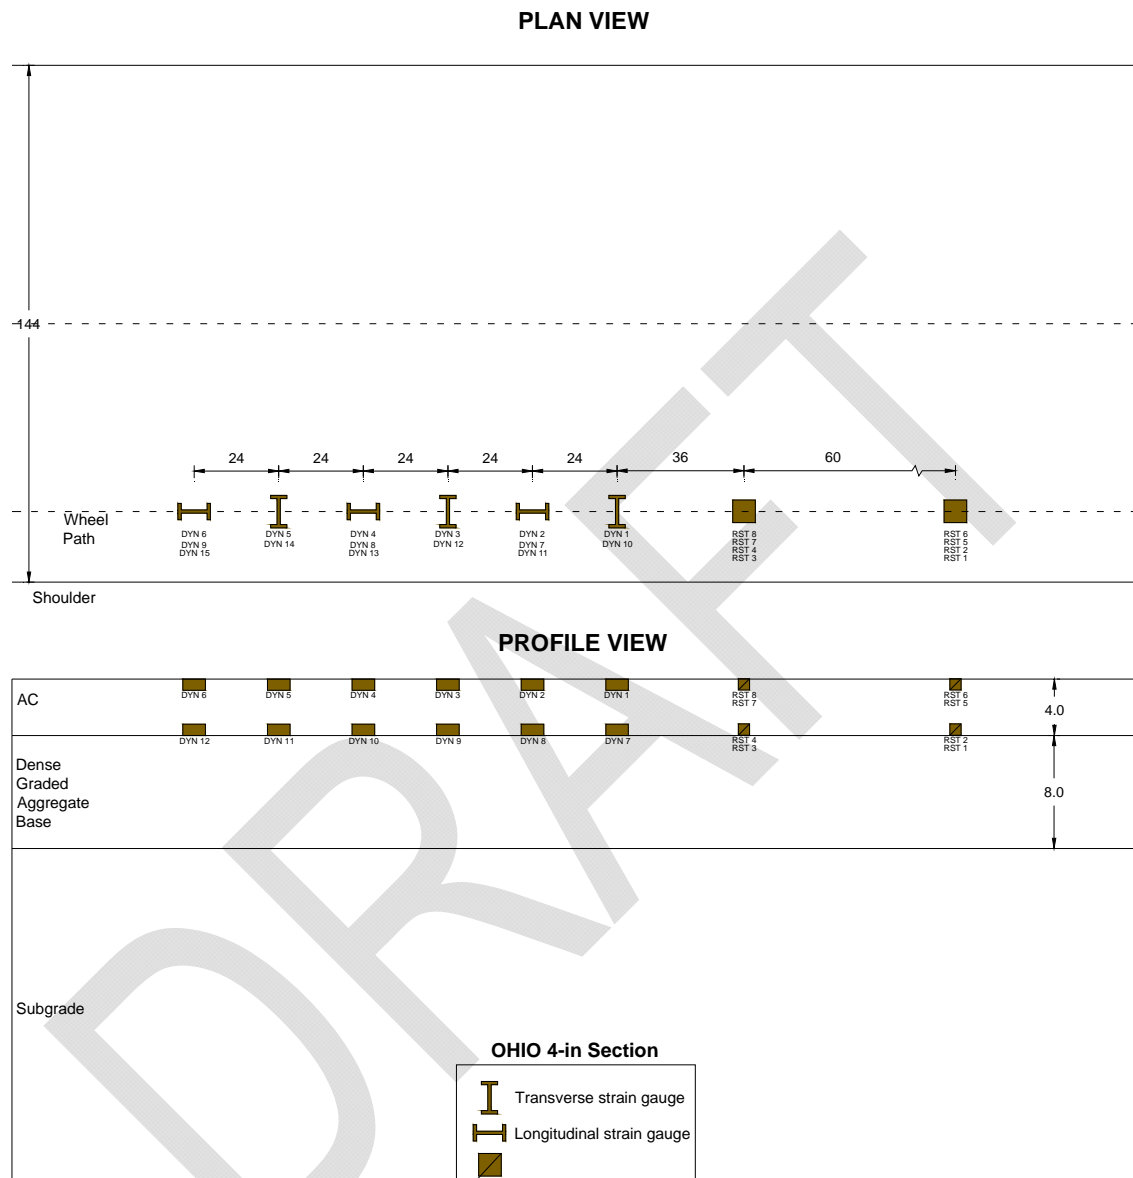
Plan and profile view of pavement structure and instrumentation of 4 in section, Ohio SPS-8.
